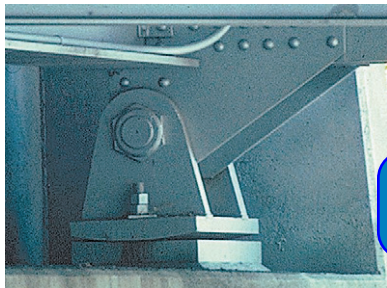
The abutment-mounted rocker bearing shown is used to support the roadway of a bridge.
